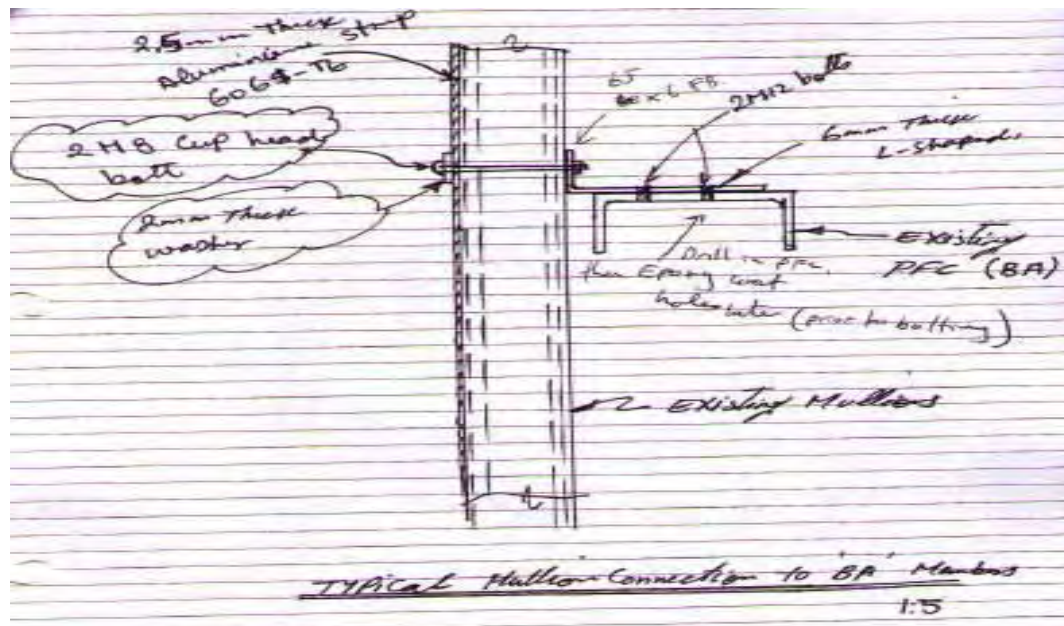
Sketch for new bracket proposed as alternative design to existing rounded bracket with tek screws.
